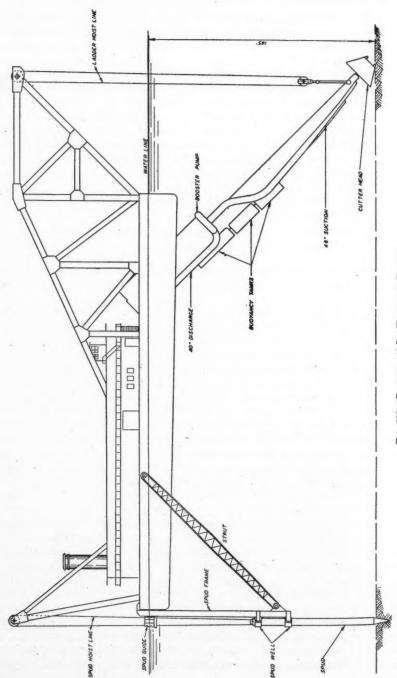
Proposed 40-In. Hydraulic Dredge
